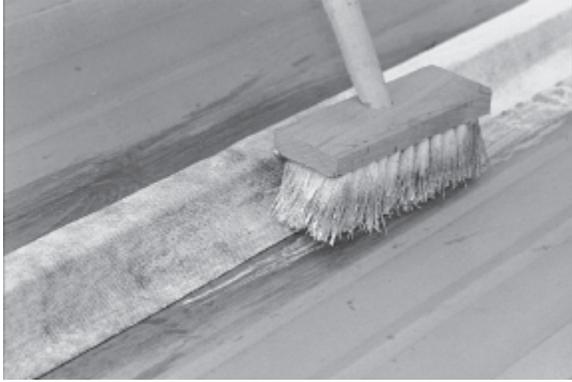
D: After installation of the Metal Guard Seam Tape, lightly prime fabric surface of the tape with Guardian General Purpose Primer and allow to dry till clear before coating.
